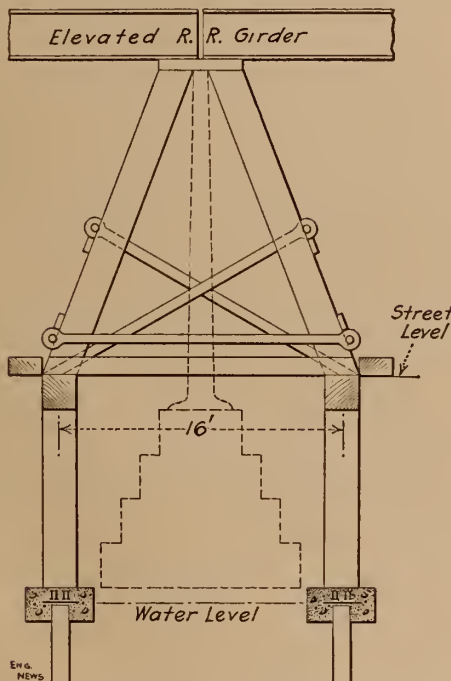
SUPPORT OF ELEVATED-RAILWAY COLUMNS ON CHURCH ST.
